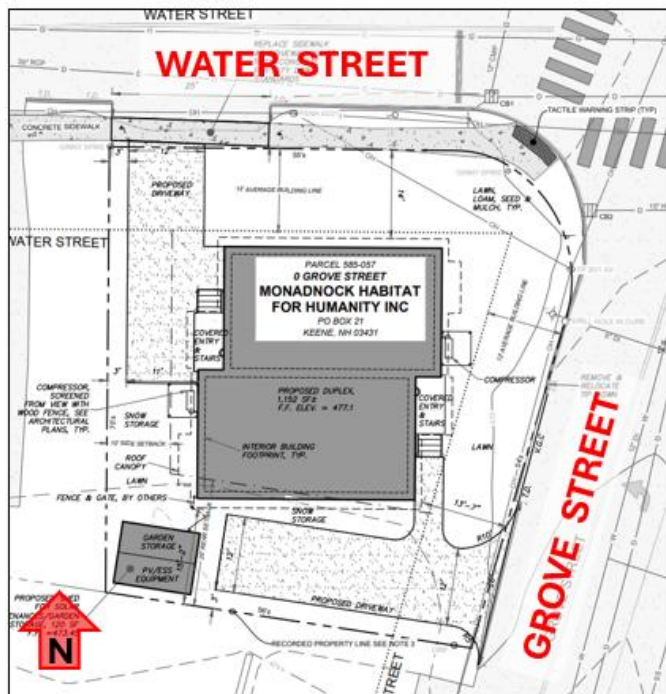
A snippet of the proposed conditions plan showing the proposed layout of the duplex at Grove St.
